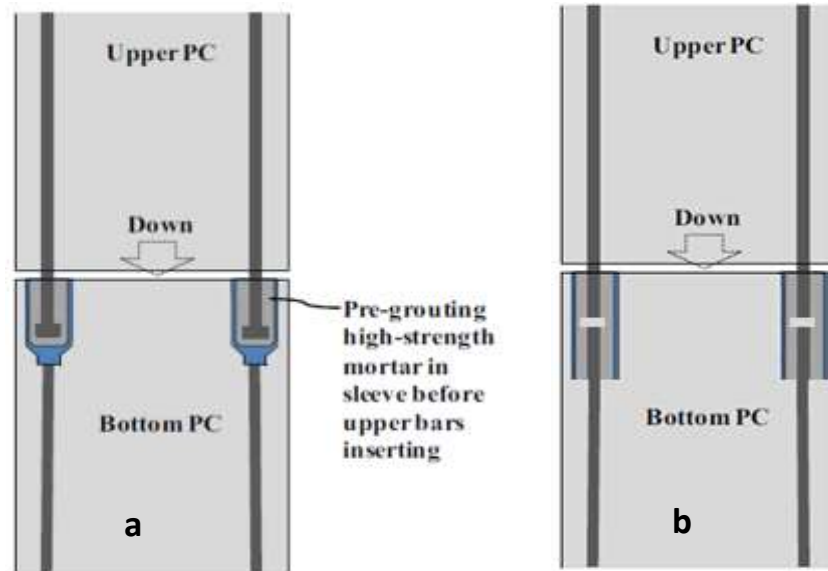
Proposed connections for preplanned splice; a- threaded sleeve splice b- grouted sleeve splice
